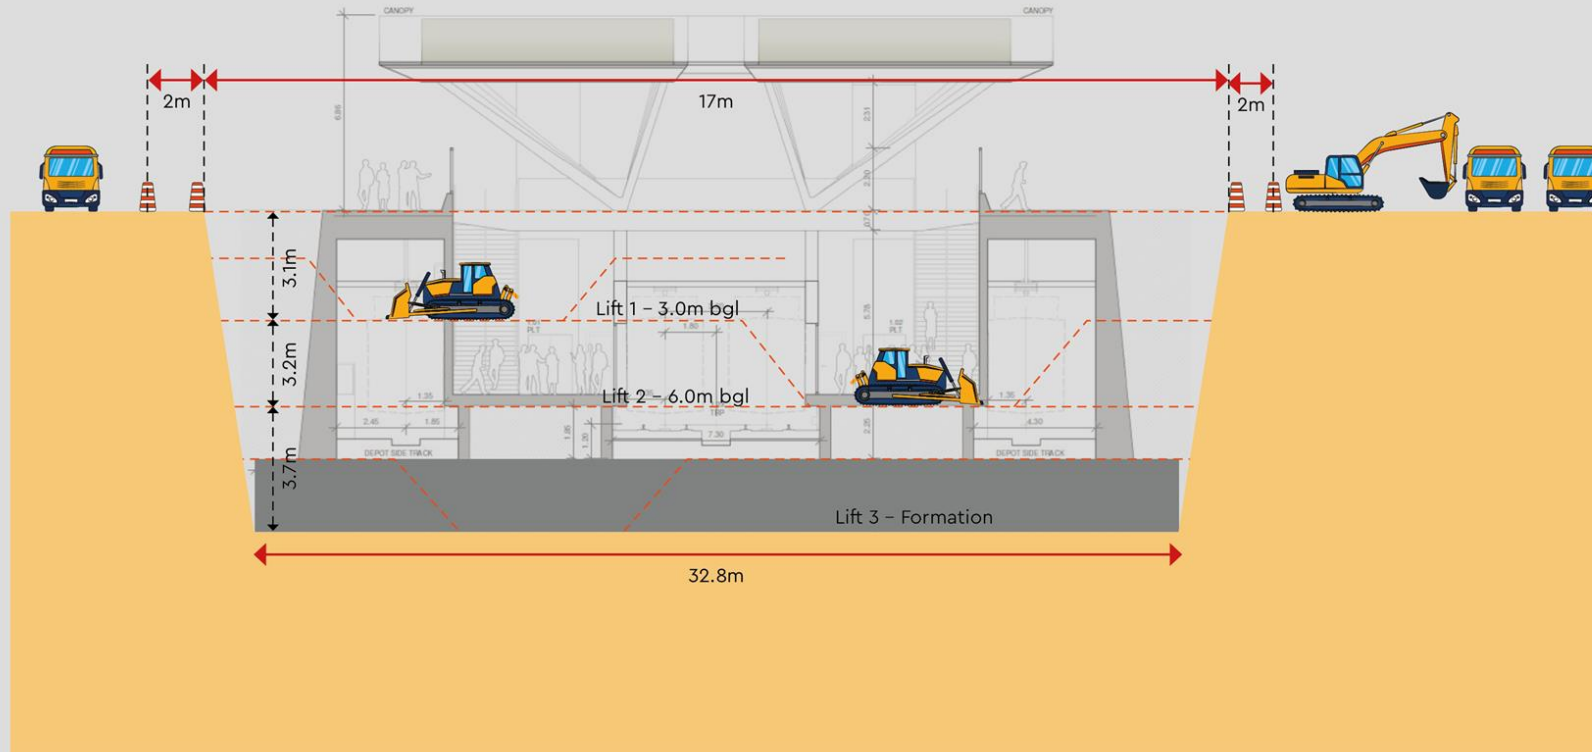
Dardistown Station Structure S3 Construction Sequence
